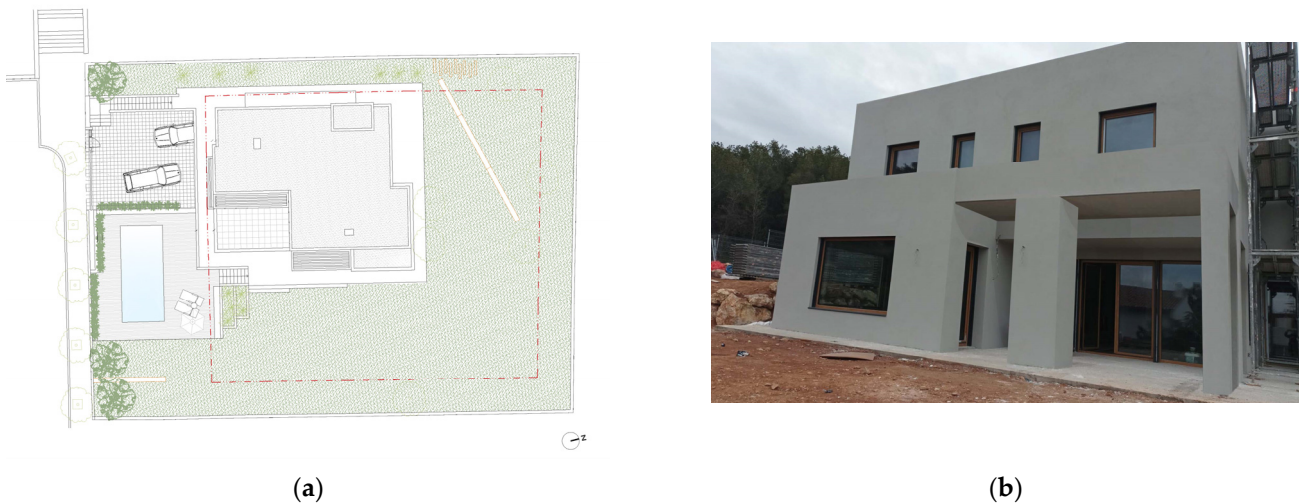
(a) Floor plan with dimensions; (b) Exterior view of south façade.
